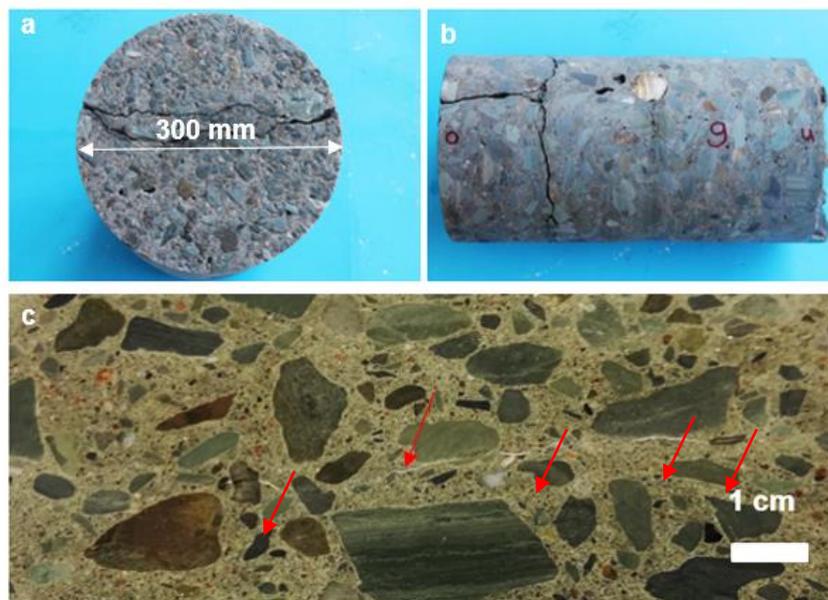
a, b) Photographs of a core from concrete pavement, c) lapped surface of Core 9 from concrete expressway showing a crack radiating from a rimmed, dark schist particle into adjacent paste. The crack is filled with white gel
